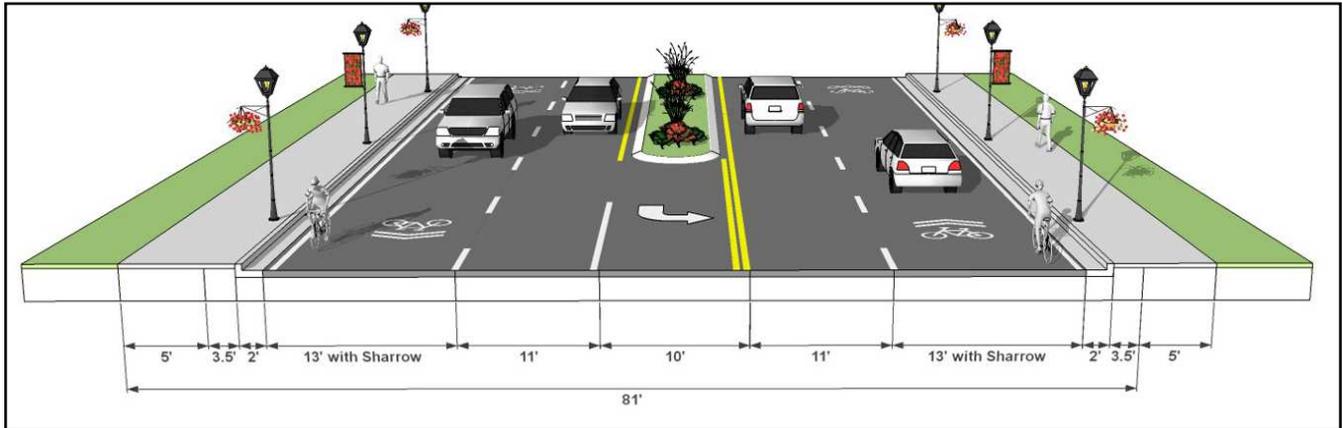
Downtown Zone – Proposed Typical Section – Option B
